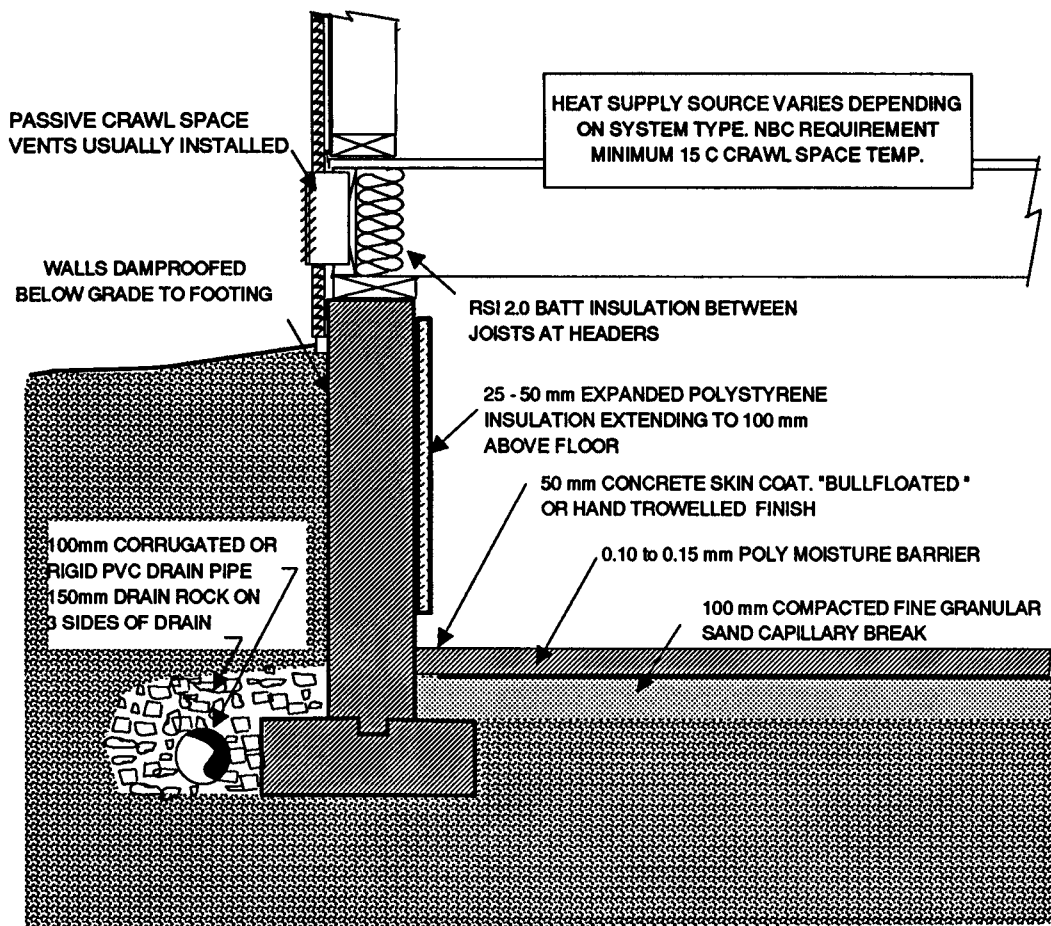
Typical Heated Crawl Space Construction in B.C.
